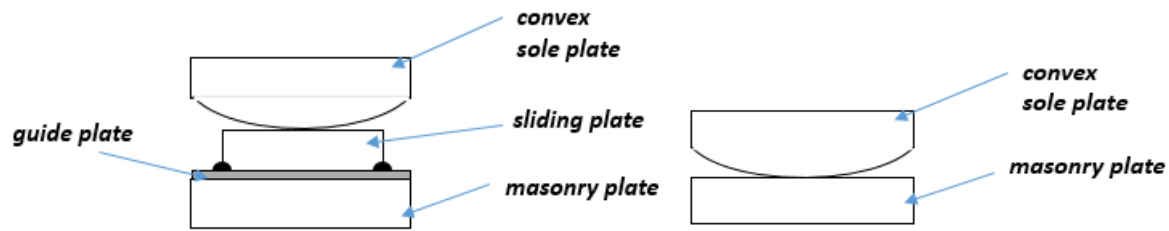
Schematic view of an expansion sliding bearing (left) and a fixed sliding bearing (right)
